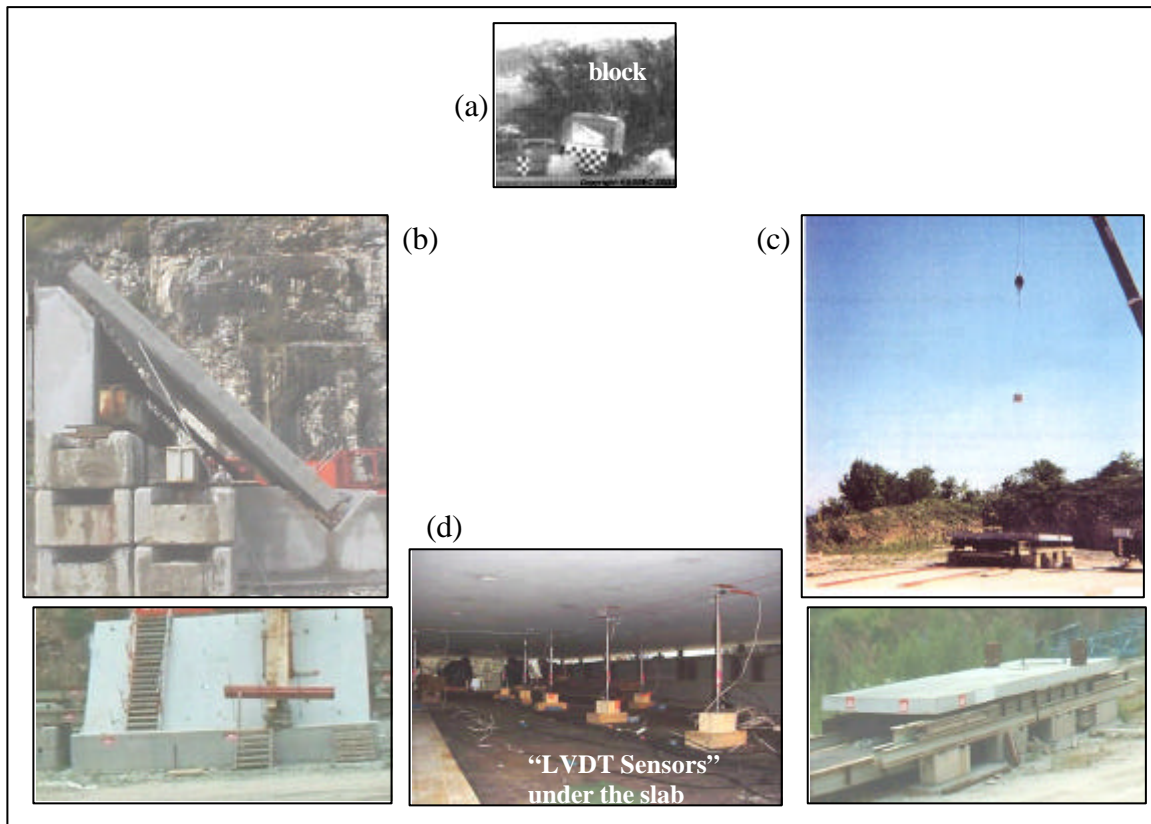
View of: (a) block, (b) slanting slab, (c) Horizontal slab and (d) Displacement transducers (LVDT) situate under the slab.
